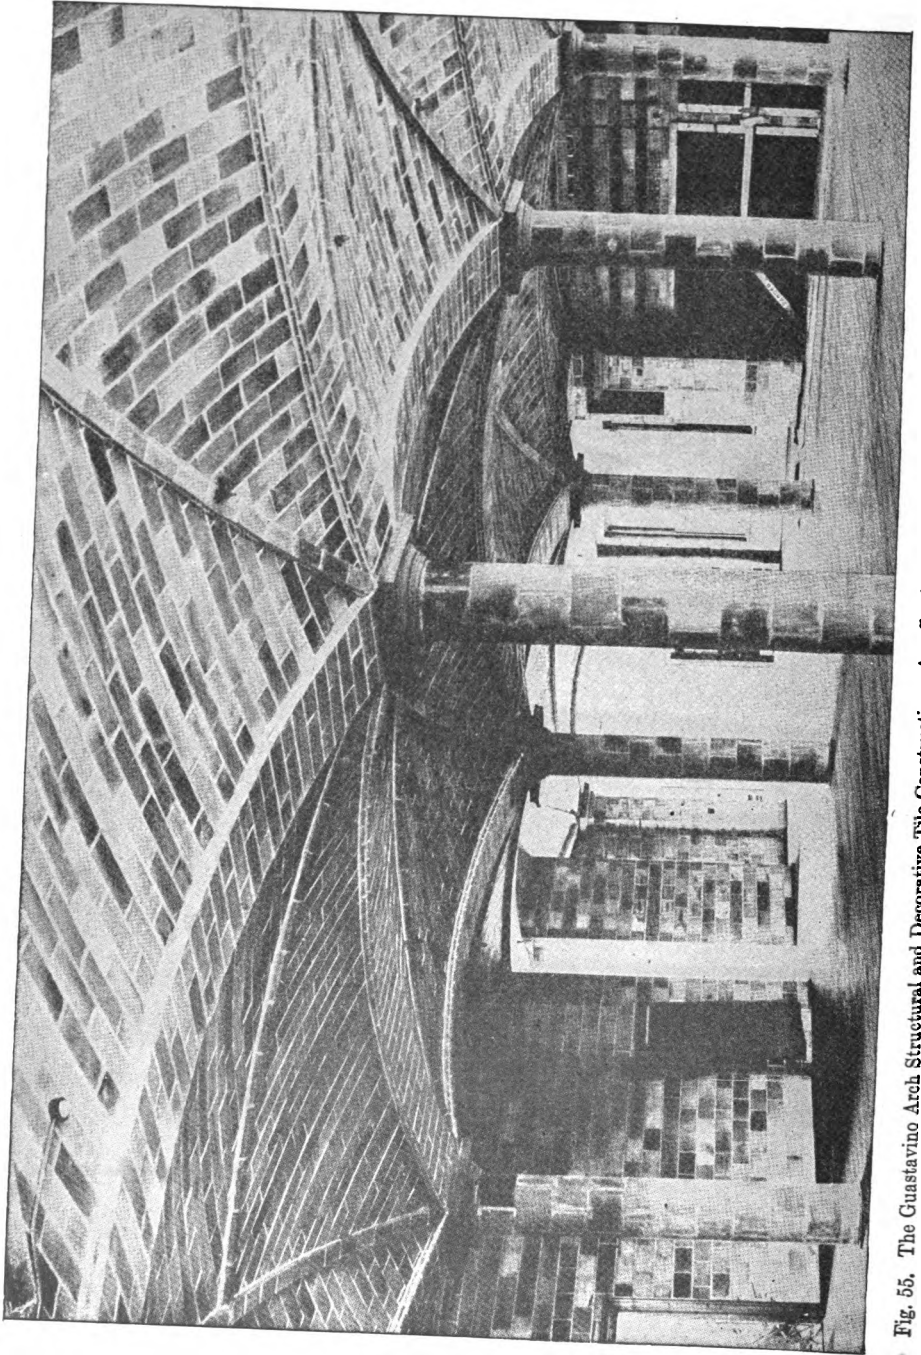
The Guastavino Arch Structural and Decorative Tile Construction—An effective reversion to its first principles of groined arch construction
